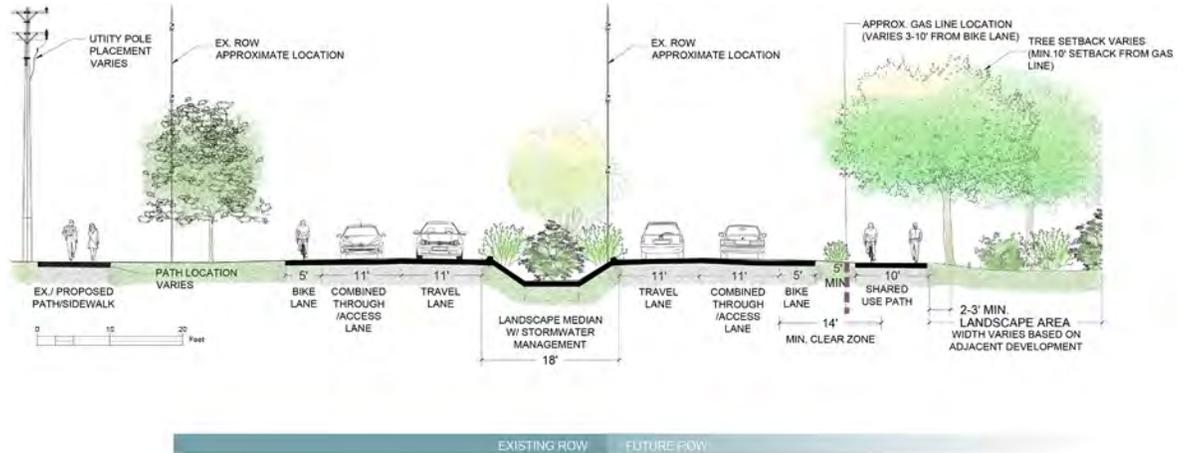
Open median drainage between Clay and South Atlantic with trail along roadside and street trees behind.
